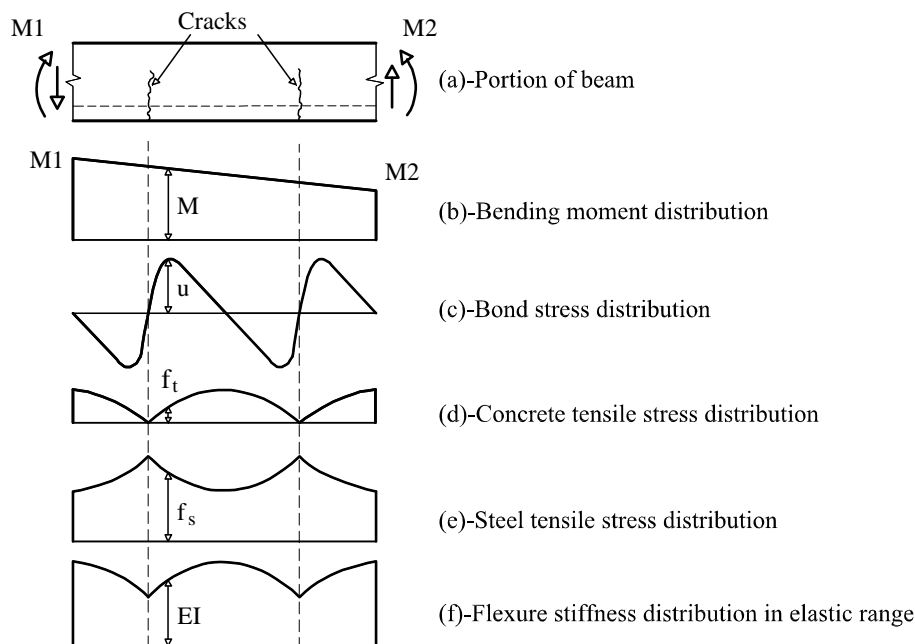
Effect of cracking in reinforced concrete beam [Kwak et al. (1990)]
